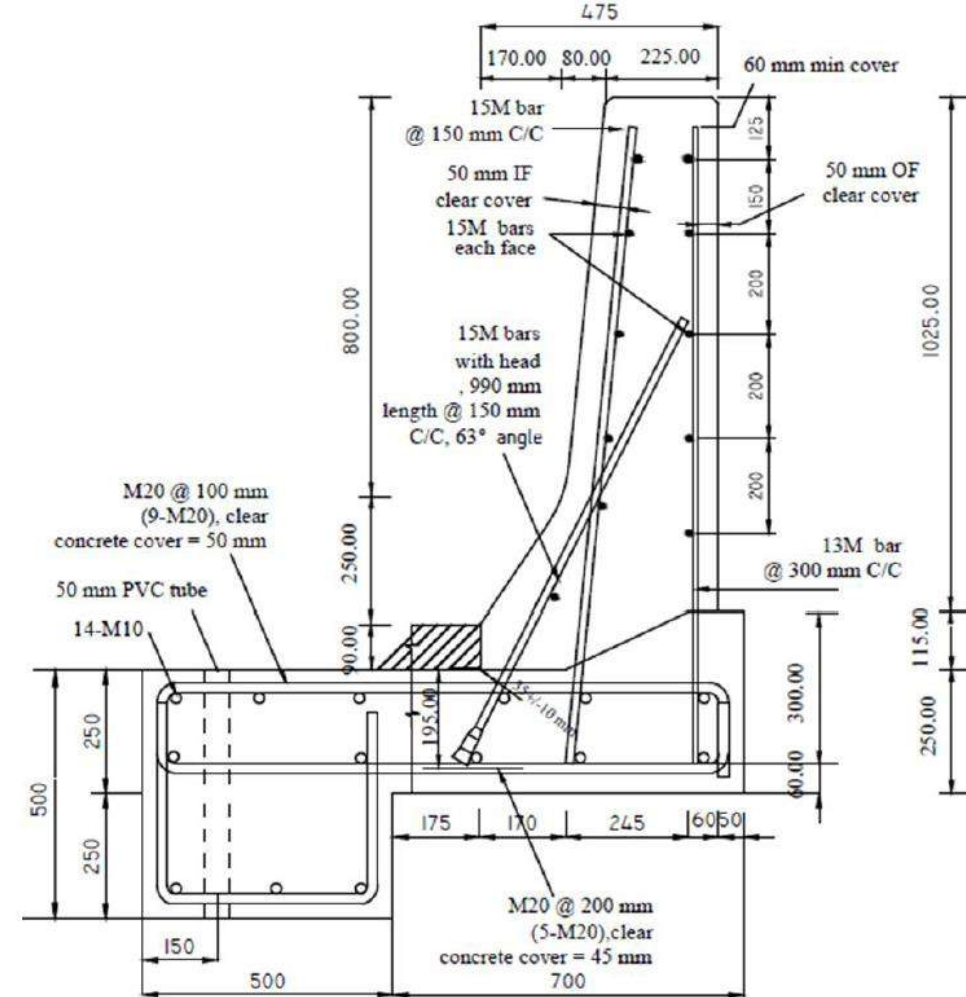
Barrier specimen B-4 details (Exterior Location - With Cantilever)
